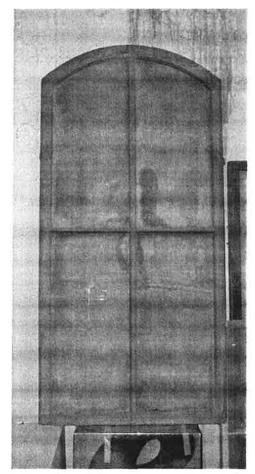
The original window sash pictured above was found in the third floor space above the north stair. It is the upper sash of one of the 4-over-4 windows. The exterior face appears to have been painted black originally. The interior side of the window appears to have also been painted.
